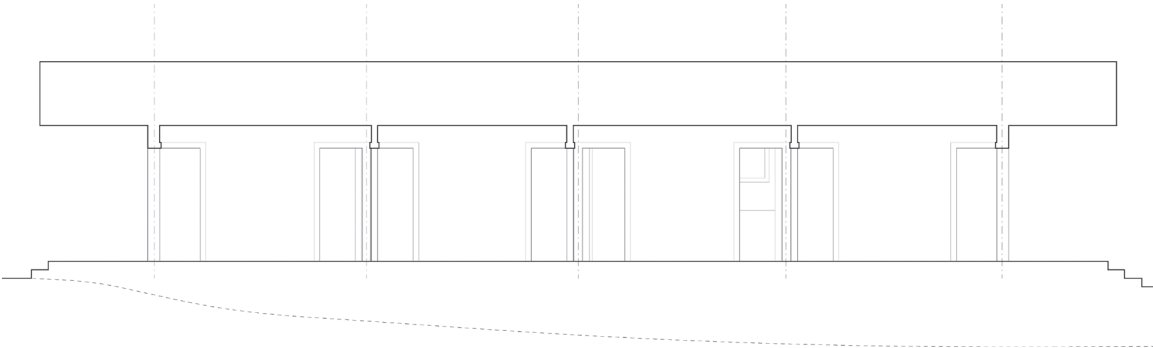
First Office, Duchamp's Shotgun House, section.
